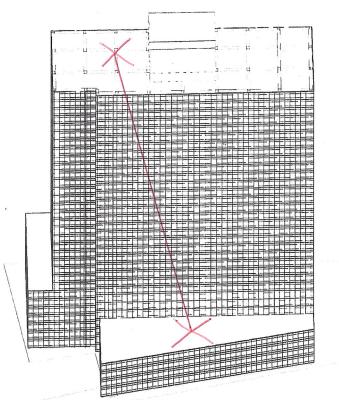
Opportunities to design with- rooftop bar and rooftop outdoor space
